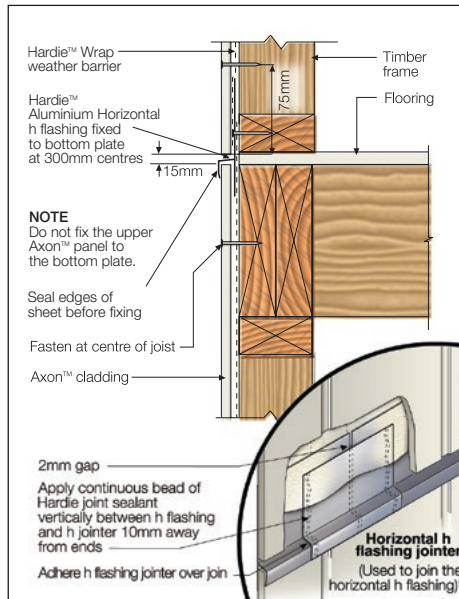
UPPER FLOOR JUNCTION/HORIZONTAL JOINT
